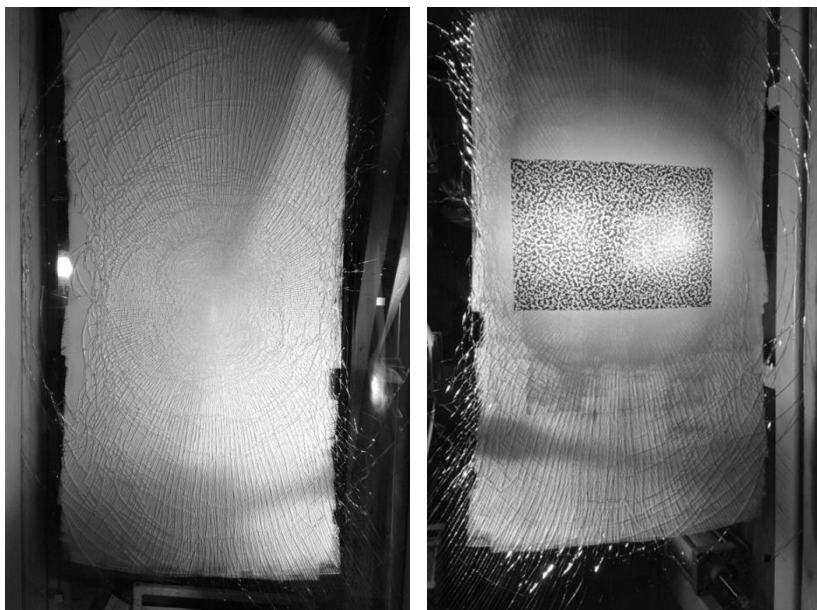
Typical post-test specimen with fractured panels but without tearing of the interlayer (front and back).
